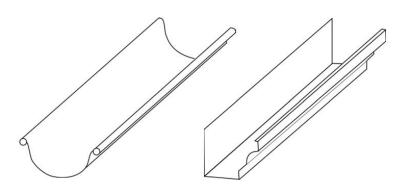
Half-round gutters (left) are the typical gutter style seen throughout the historic district. Half-round gutters best represent the rain system style of colonial houses. K-style gutters (right) were introduced in the late 1940s.
